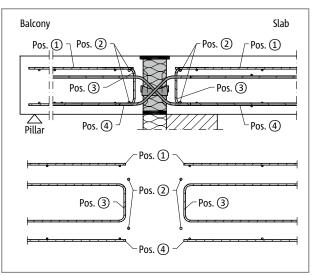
Schöck Isokorb® T type Q-V6 up to Q-V10: On-site reinforcement
